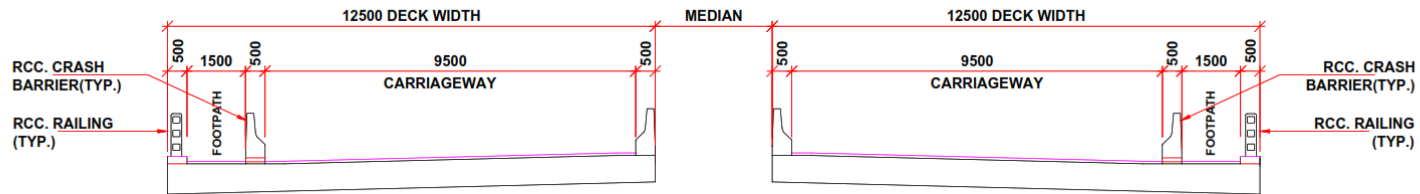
(a): CROSS SECTION OF BRIDGE AT DECK LEVEL - WITH FOOTPATH 4 LANE DIVIDED HIGHWAY
